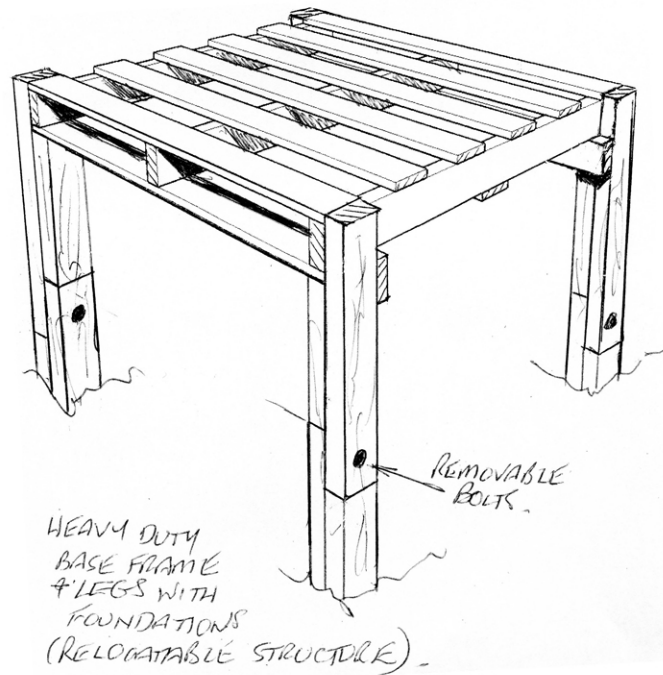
Elevated Cubby house with sandpit - shear webs would be added to provide rigidity and shade/wind screening.
